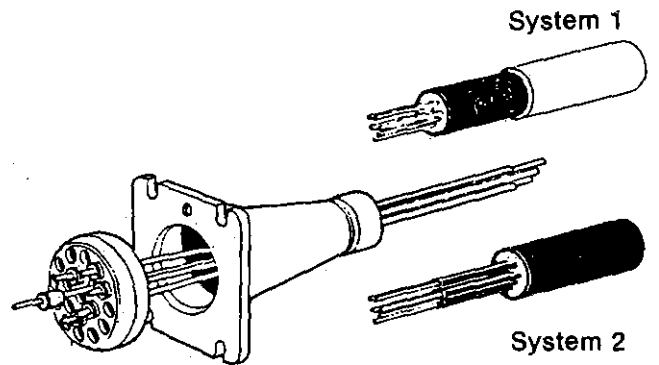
12 K 15 External prestressing anchorage (Freyssinet)
